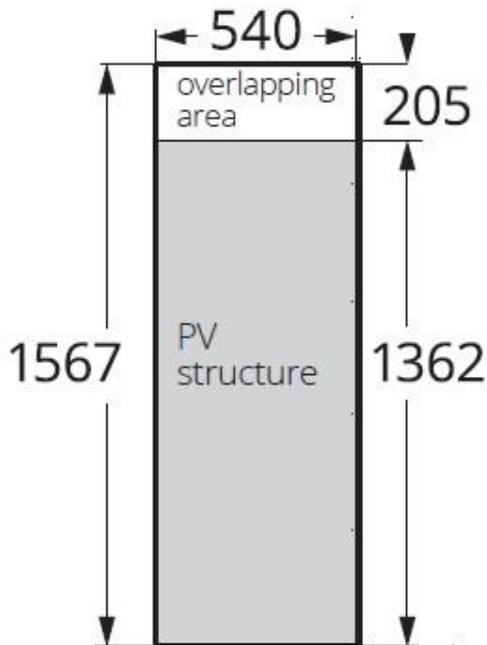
Roofit 3x8/90-100W dimensions, mm [16]
